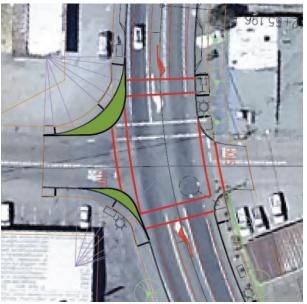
Potential curb bump out design for intersection of Highway 101 and Branscomb Road (Source: Laytonville Traffic Calming and Revitalization Plan, 2008)
